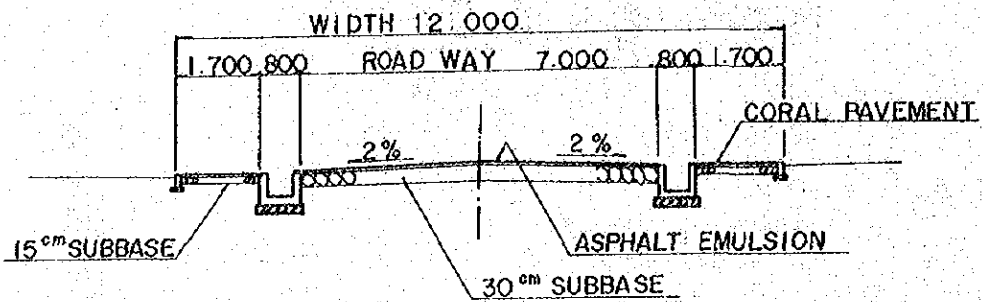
6 - 2 - (5) ACCESS ROAD SECTION
